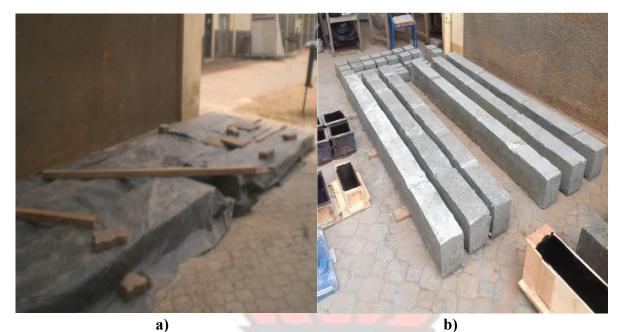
a) Beams curing under damp hessian sacks covered with tarpaulin, and b) Fresh beams just after stripping from formwork
